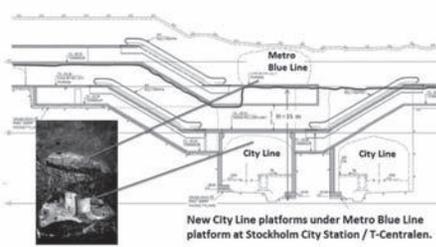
Excavating the 57, 200 m³ City Line platform chambers directly under the metro.
